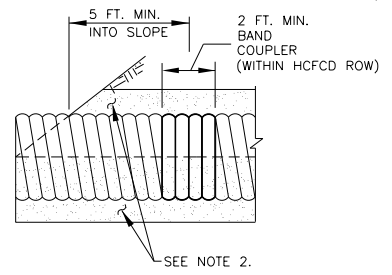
DETAIL "A" TYPICAL TOEWALL CONSTRUCTION
